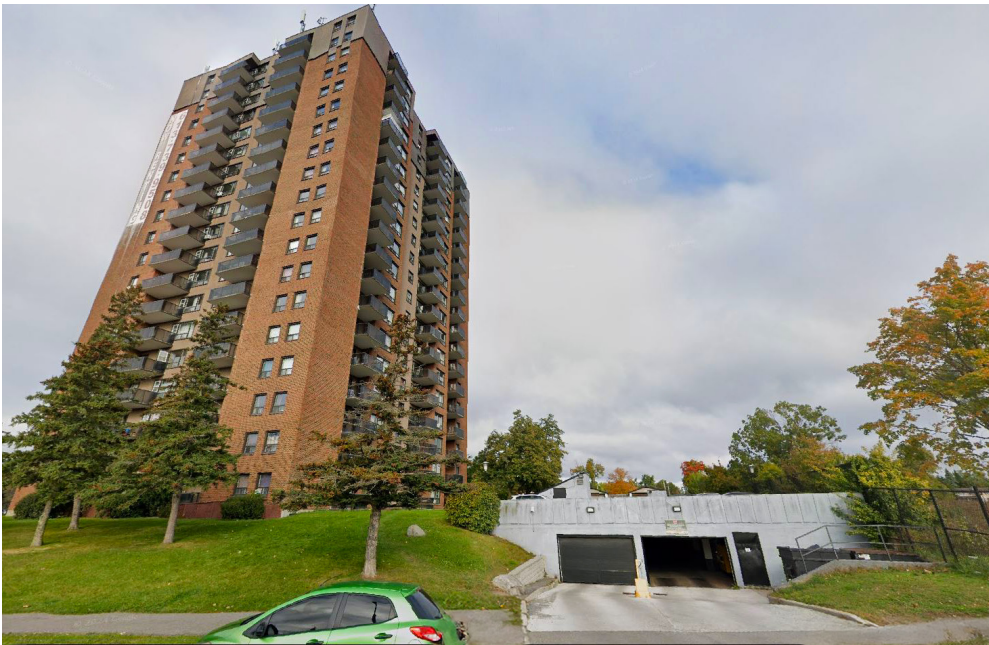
Sandalwood Dr. - The Cardinal Parkade Access
